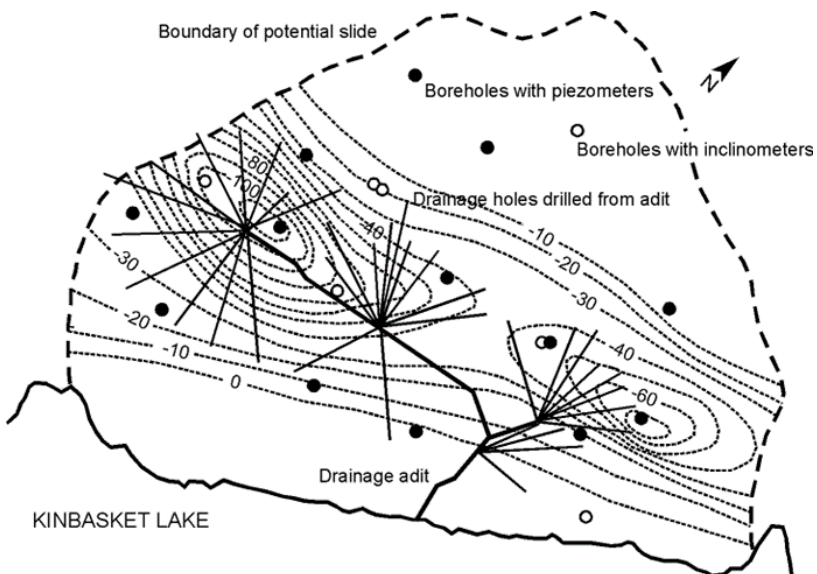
Extent of potential slide with layout of drainage gallery and drain holes drilled from underground. Contours indicate the drawdown of the groundwater levels achieved by the drainage.
